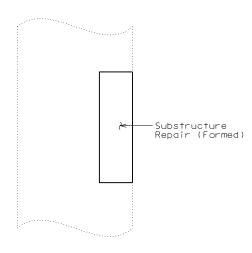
DETAIL OF SUBSTRUCTURE REPAIR AT END BENT NO. 1
